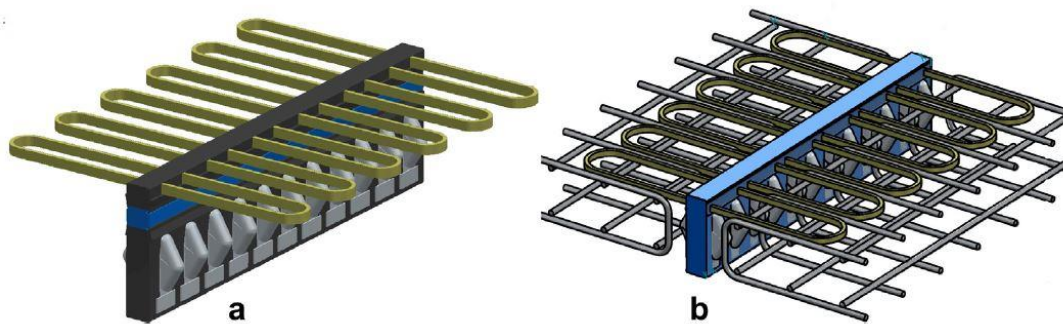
Thermal break: a) prefabricated A/GFRP b) the break placed from top into pre-installed concrete slab reinforcement (Goulouti et al., 2016)
